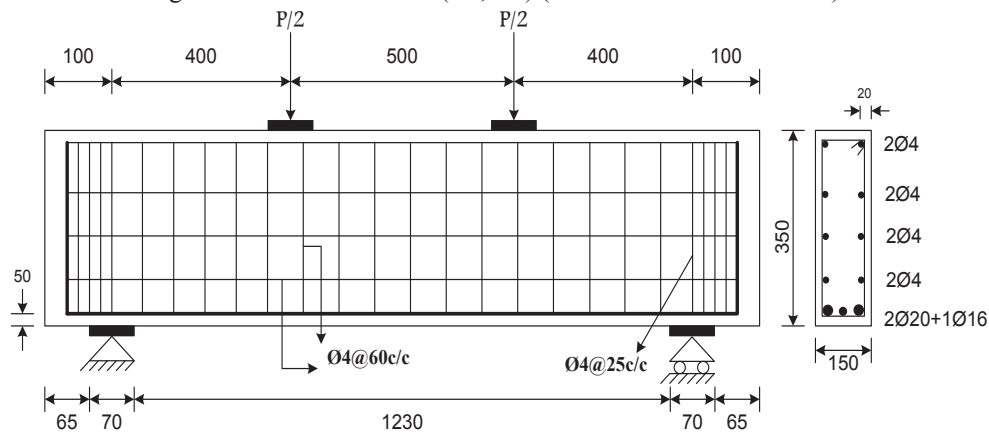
Details of Beams (B9, B10) (All Dimensions are in mm).
